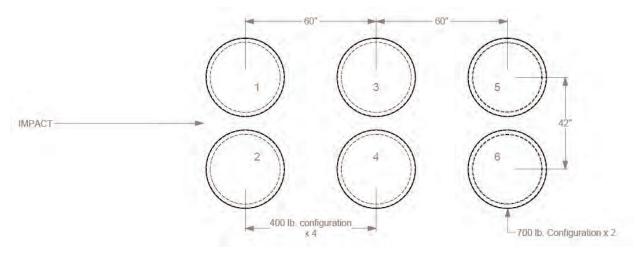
Weight Example for Barrel Layout Naming Convention.
